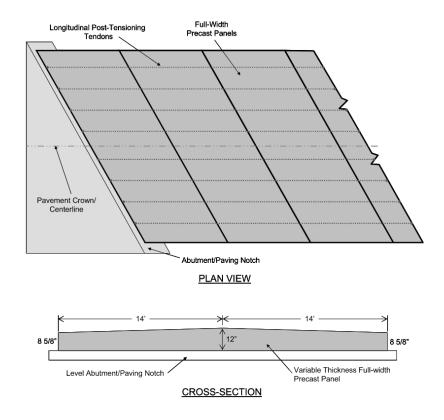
Full-Width Precast Concrete Approach Slabs (Merritt et.al., 2007)
